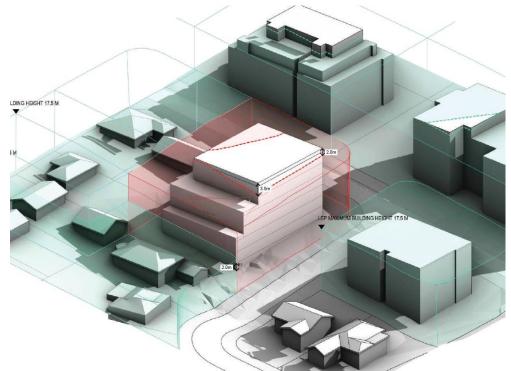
Previous Concept Development Application for an RFB Building Envelope
